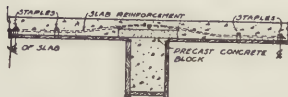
Concrete Block Support for Slab Steel Over Beams.
